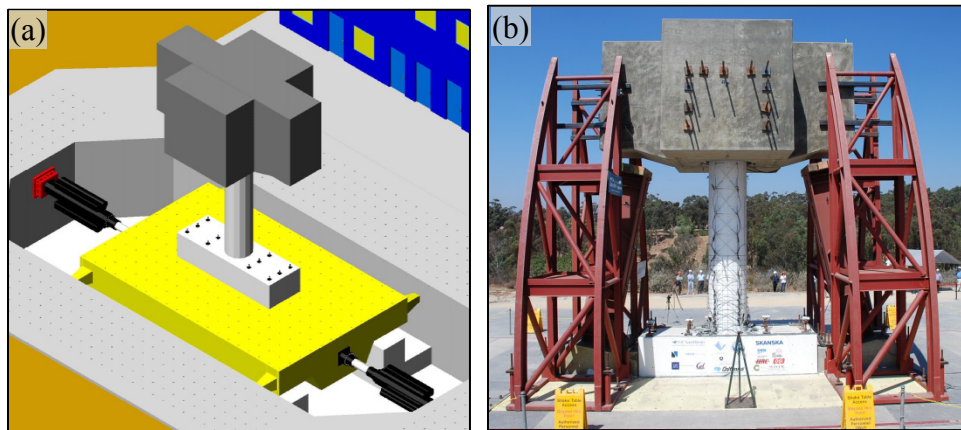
Full-scale bridge column test setup (a) 3D view scheme from top and (b) front view (photo taken from: <https://nees.org/warehouse/project/987/>)
